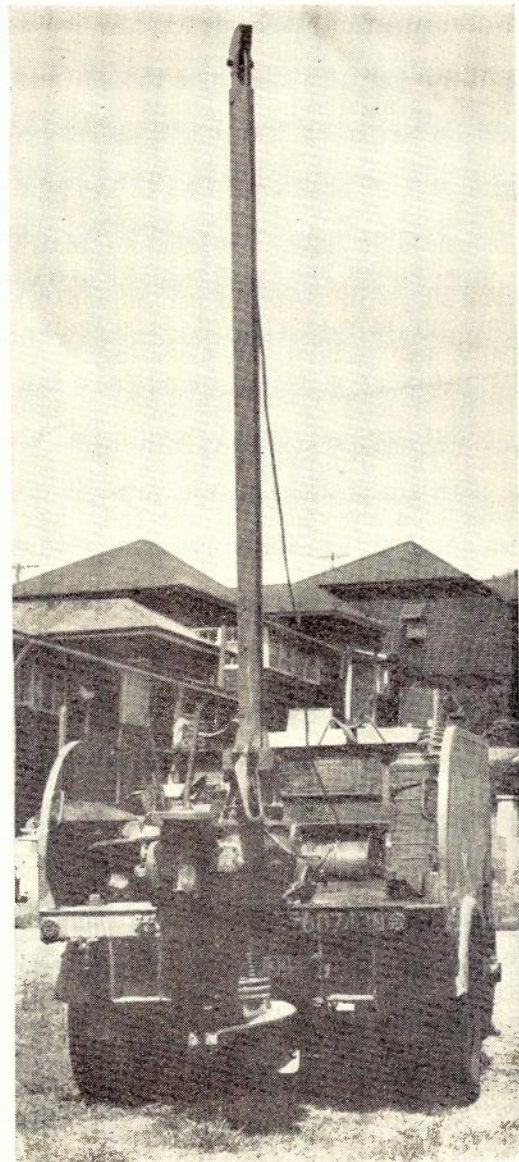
End View of Boring Machine with Boom in Vertical Position Ready for Boring.
